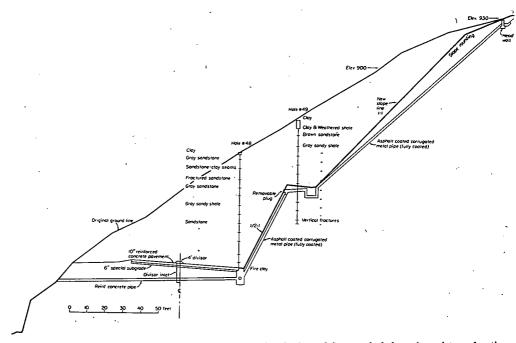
Cuts as high as 190 feet made in alternating horizontal layers of shale and sandstone for the West End Bypass at Pittsburgh, Pa. The design includes use of a single 16-foot-wide bench at varying heights above the roadway, with 1/4:1 to 1/2:1 slopes for the material below the bench and 1:1 slopes above it. This is a typical cross-section for one of the deeper cuts, showing borings and details of slope and slope drainage. (After Roads and Streets, 1950)
